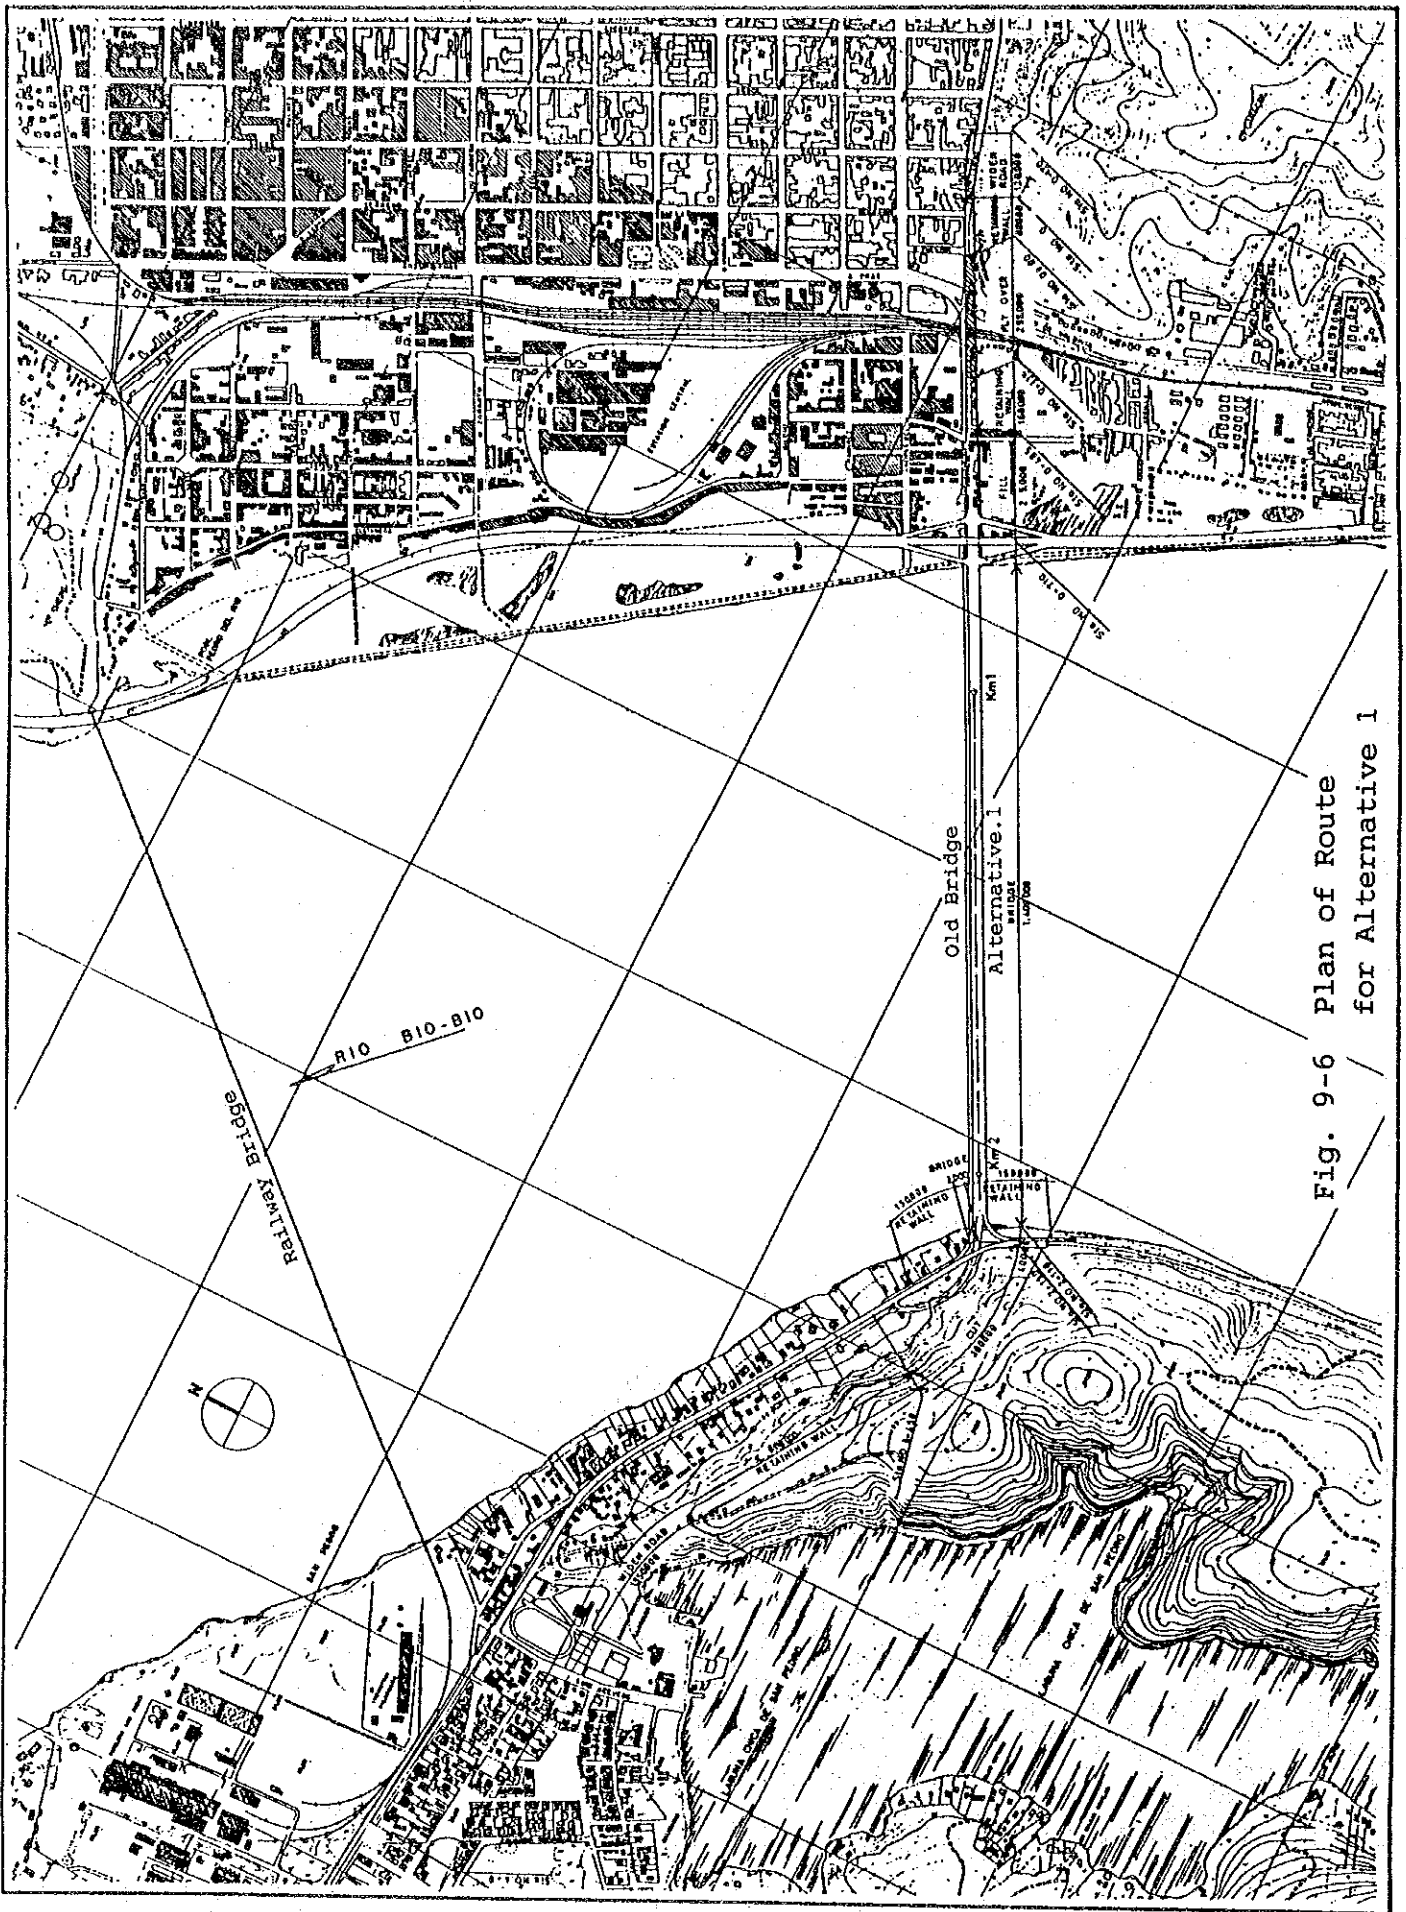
Plan of Route Alternative 1 for Alternative 1
